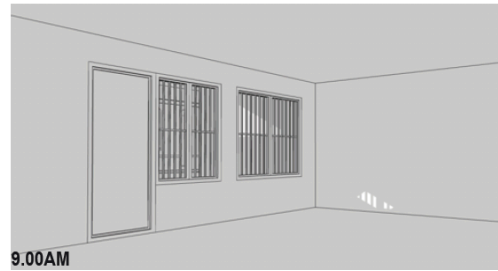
Unit 29/23 Buckland Street – Internal View Existing and Proposed
